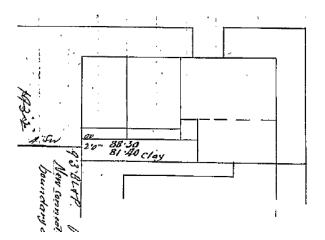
Plan showing footprints of the corner buildings at 295-297 Brunswick Street, and those fronting Johnston Street, dated October 1911. North is up (Property Sewerage Plan No. 78134, 30 October 1911)
